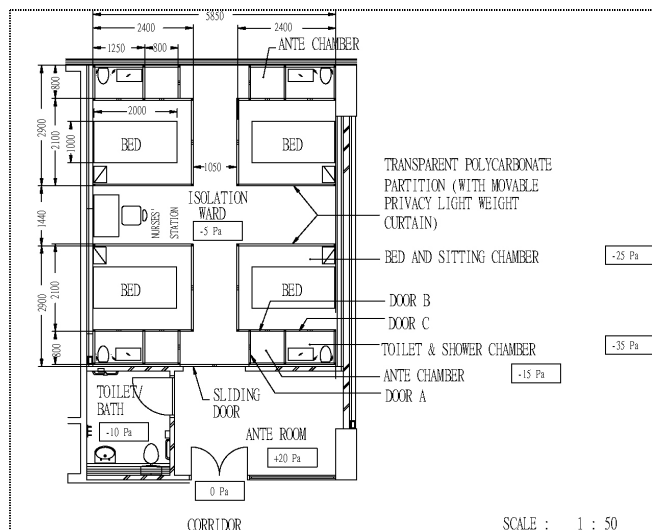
LAYOUT OF 4 PROPOSED MINI-EN-SUITES
